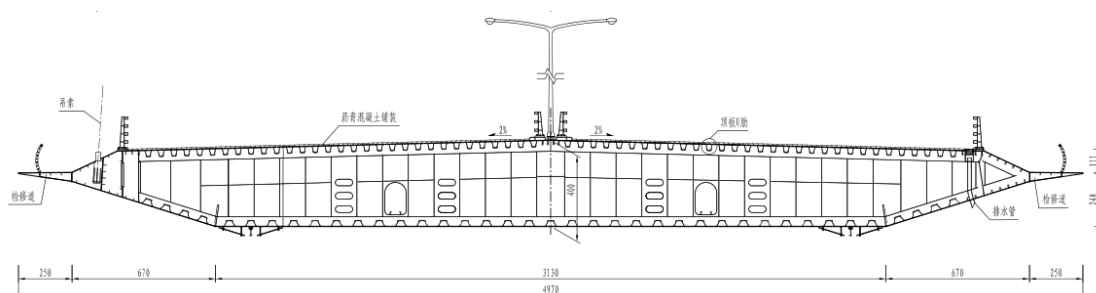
Single box girder with horizontal stabilizers (unit: cm)
